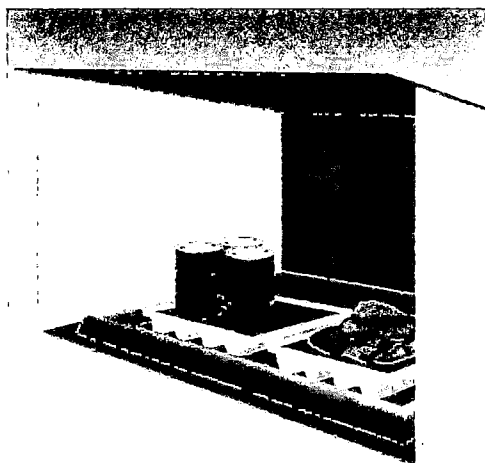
Illustration showing construction materials with secondary containment and overhead cover to prevent stormwater contamination.
